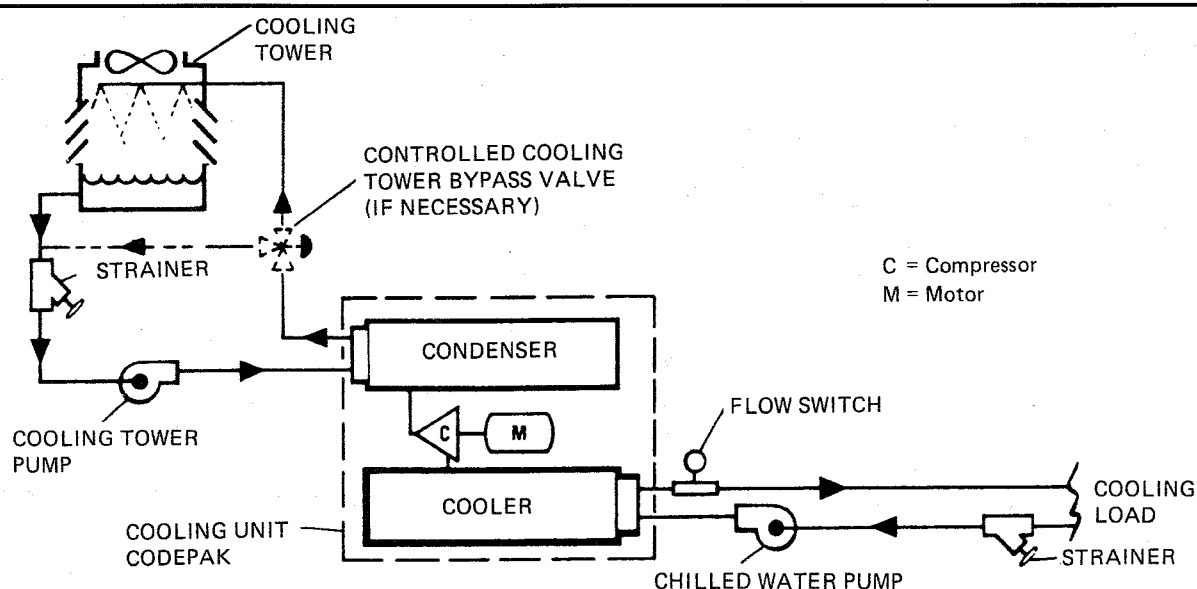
SCHEMATIC OF A TYPICAL PIPING ARRANGEMENT
